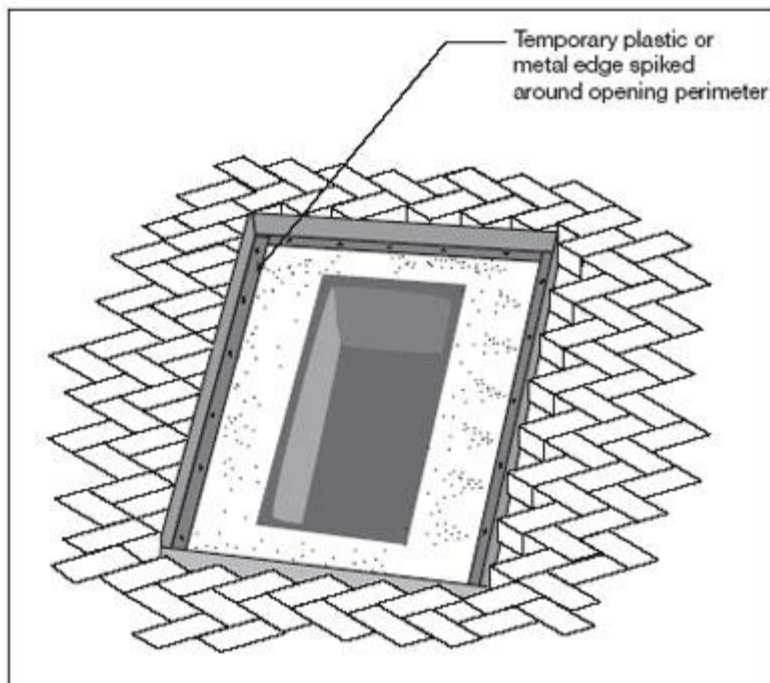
Temporary bracing at the pavement opening will help keep units in place during excavation, repairs and reinstatement.
